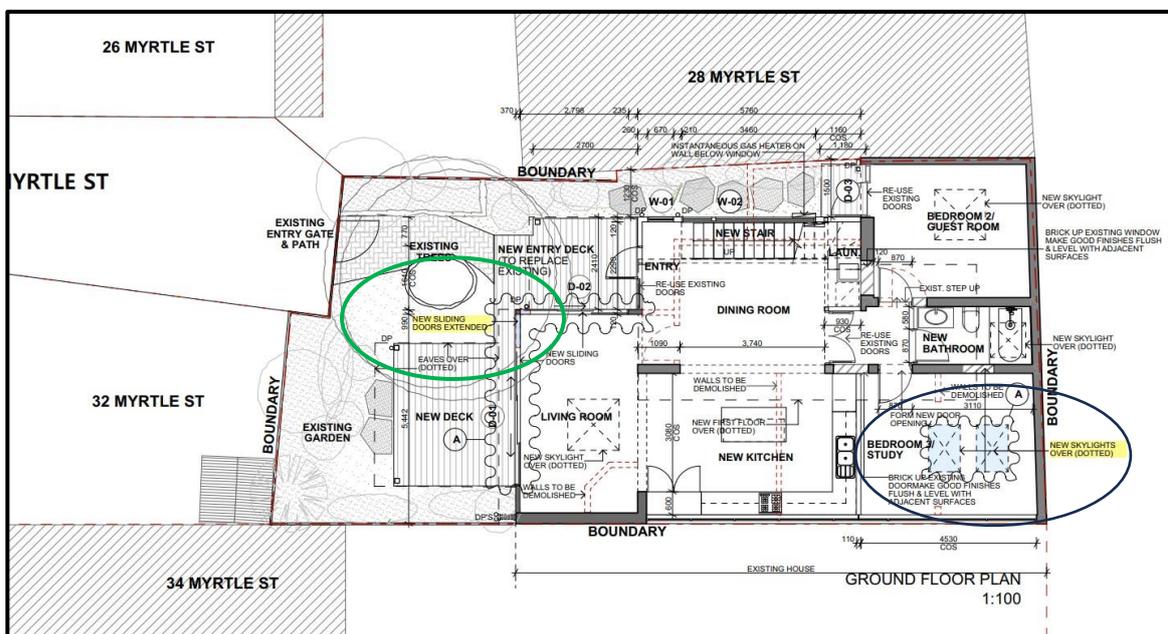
Ground floor plan showing additional sliding door (circled in green) and new skylights (circled in dark blue)
